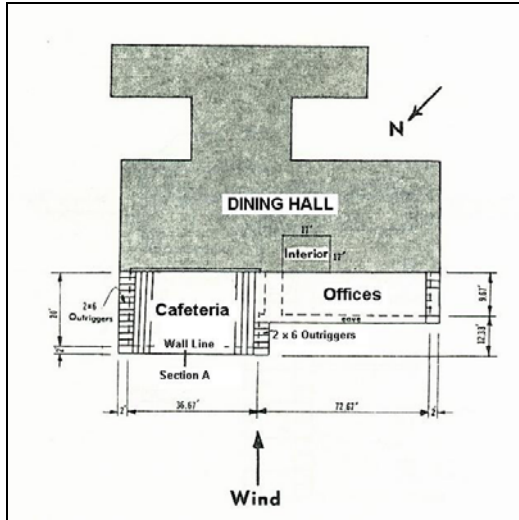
Roof plan diagram of the dining hall. The northwest section of this roof was uplifted (not shaded). The roof was relatively flat and composed of wooden joists supported by steel beams and masonry walls.
